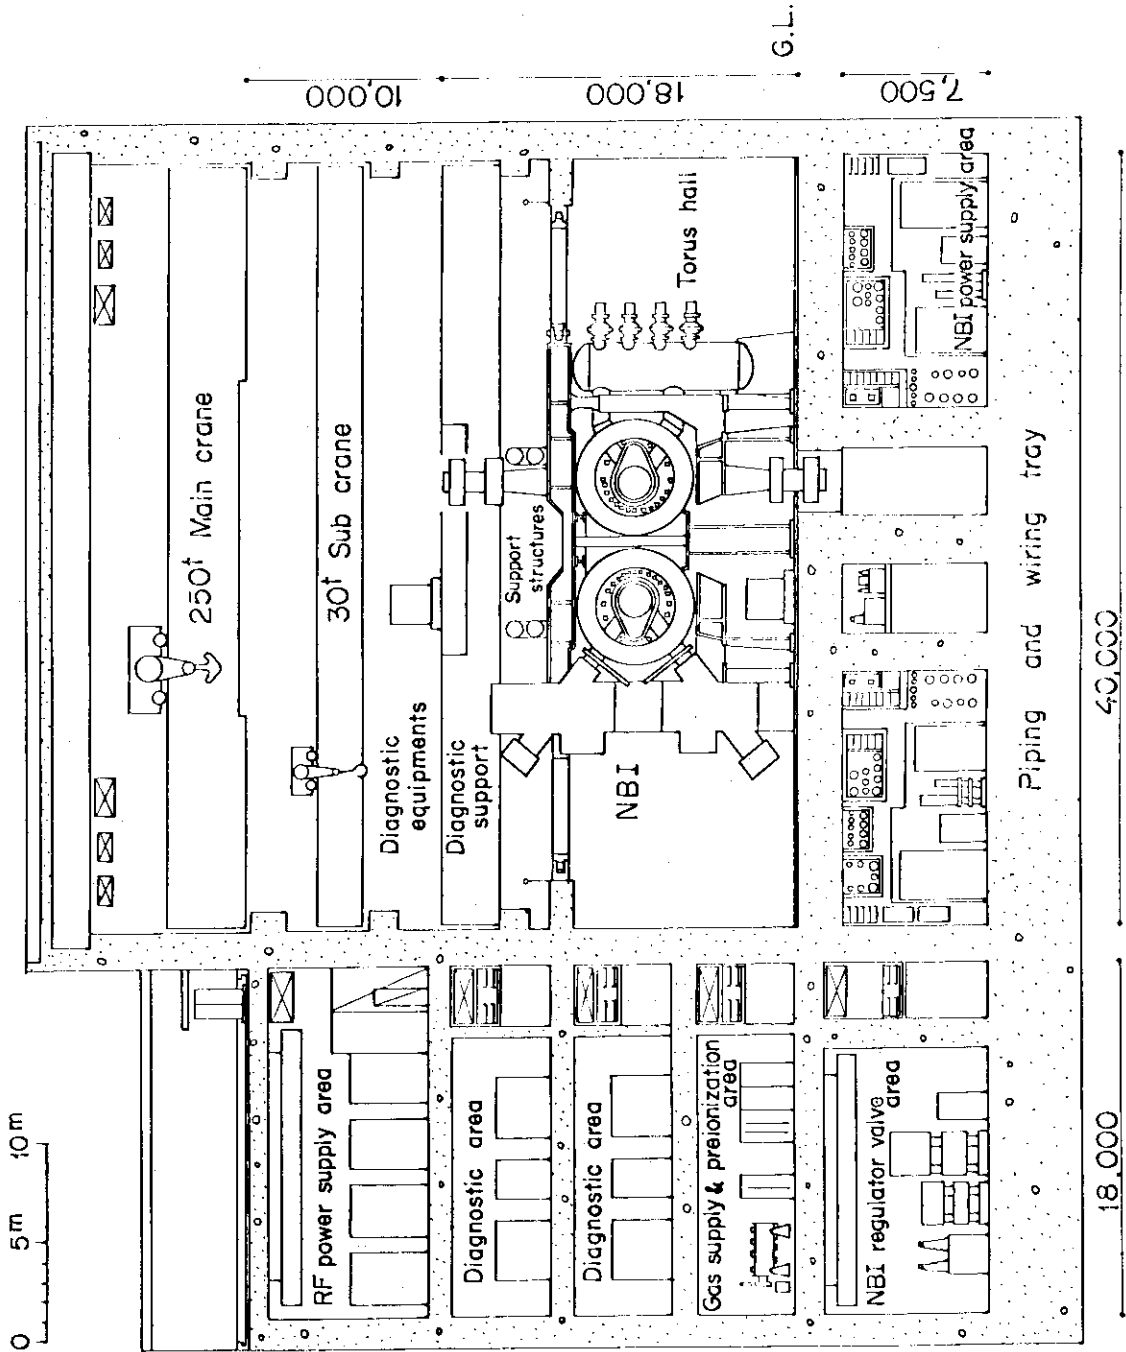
Layout in experimental building ---- cross sectional view.
